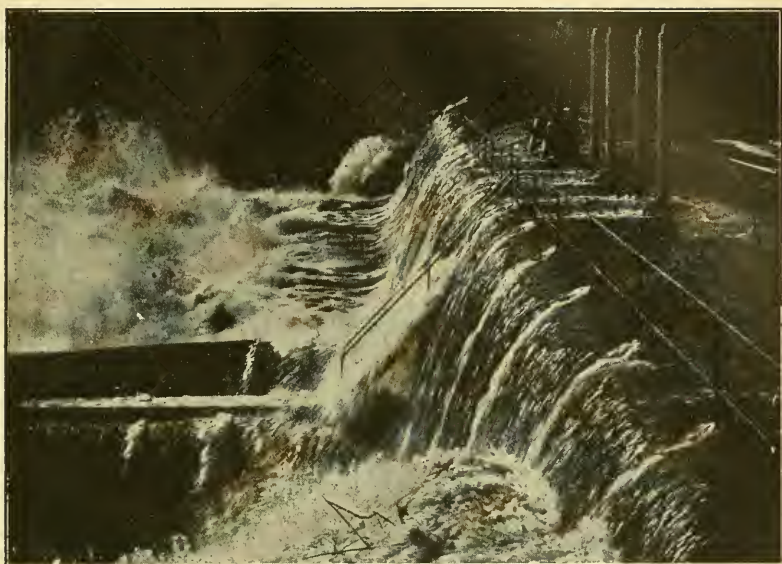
TARIFFVILLE DAM, WITH 9.5-FOOT FLOOD.
